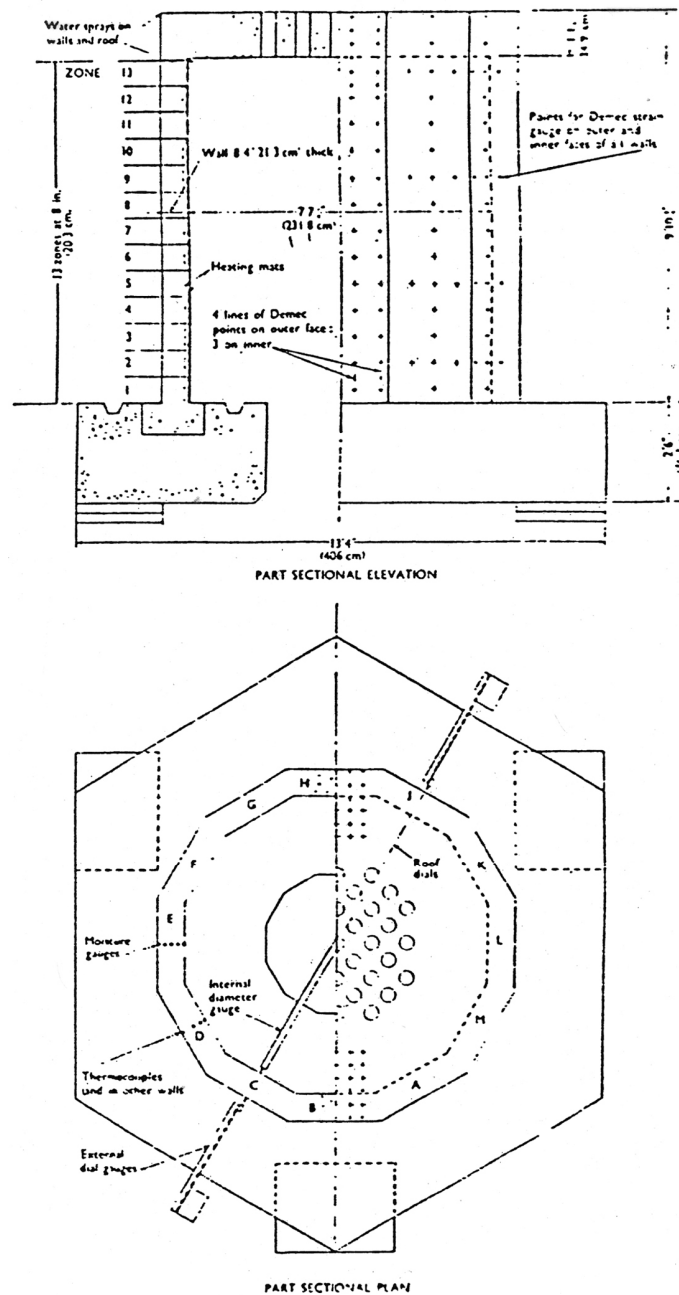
1:10-scale Hinkley Pt. A primary shield model. *Source:* C. R. Lee et al., "Behaviour of Model Concrete Structures Under Temperature Loading," Group G, Paper 46, *Prestressed Concrete Pressure Vessels*, Institution of Civil Engineers, London, pp. 517–525, 1968.
